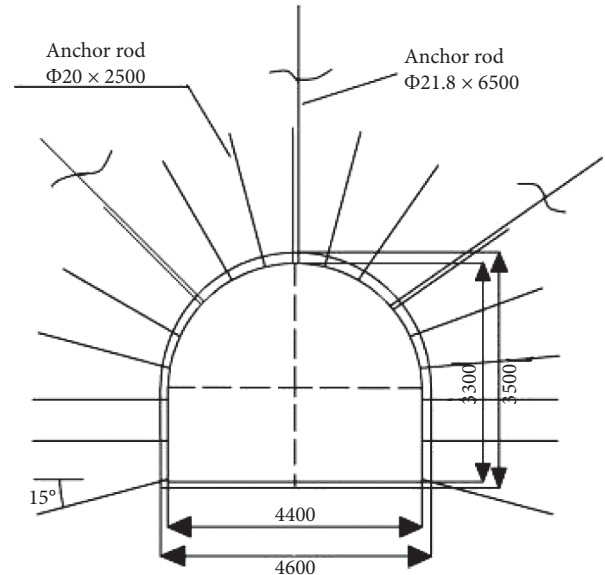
Cross-section design of the supporting scheme of 11123 floor gas drainage roadway.
